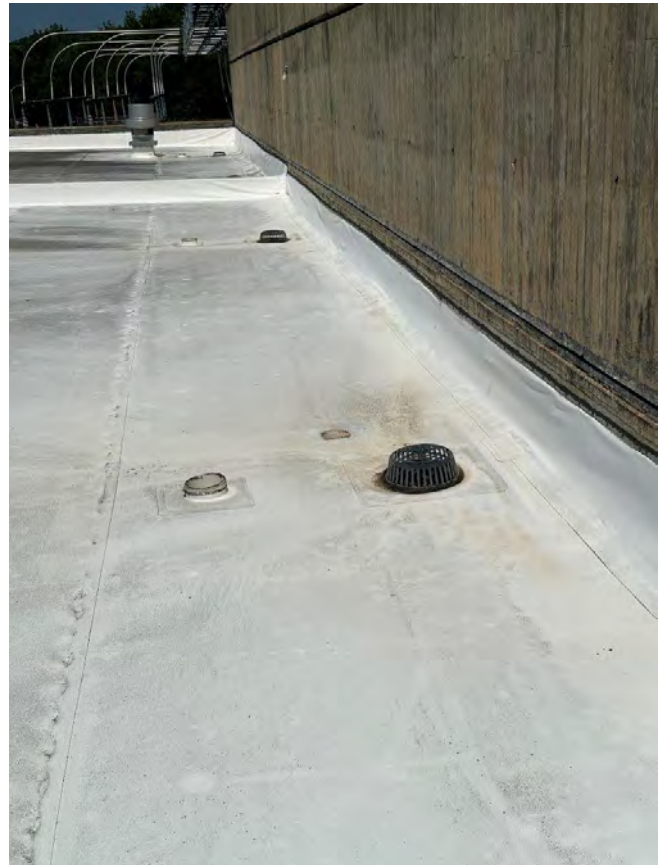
Typical view of roof drain and overflow drains along lower roof north wall,
